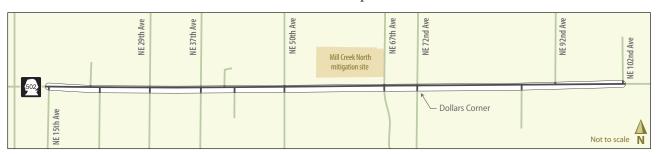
White Alternative: widen NE 219th St, hold north right of way line
